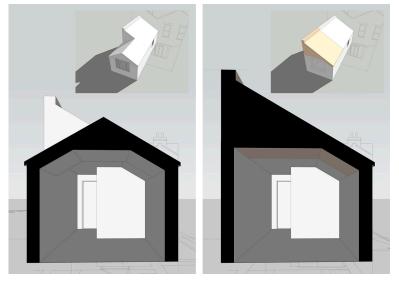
Proposed bedroom ceiling sectional profile within the existing and proposed outrigger - 3D illustration.
